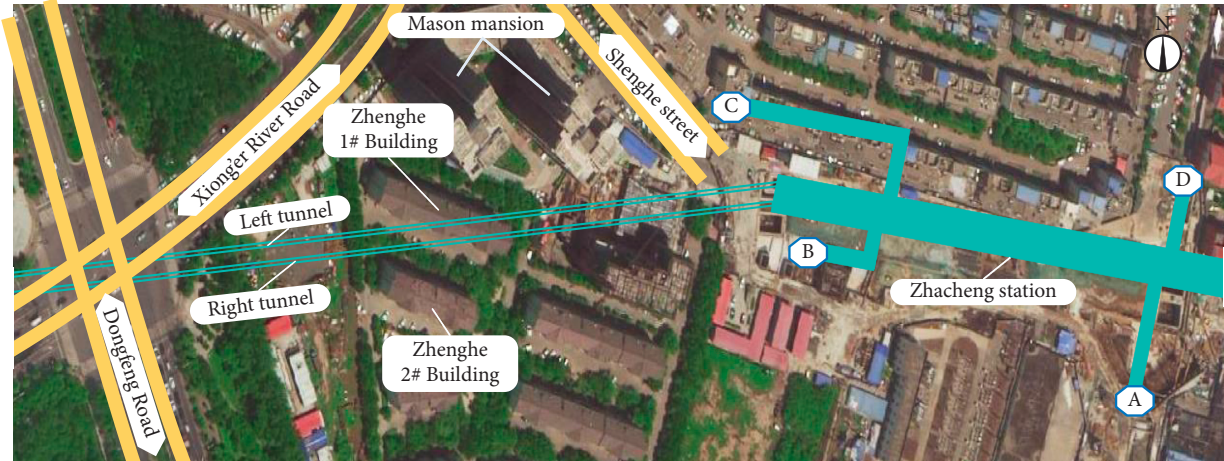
Plan view of shield tunnel cut pile passing through masonry structure.
